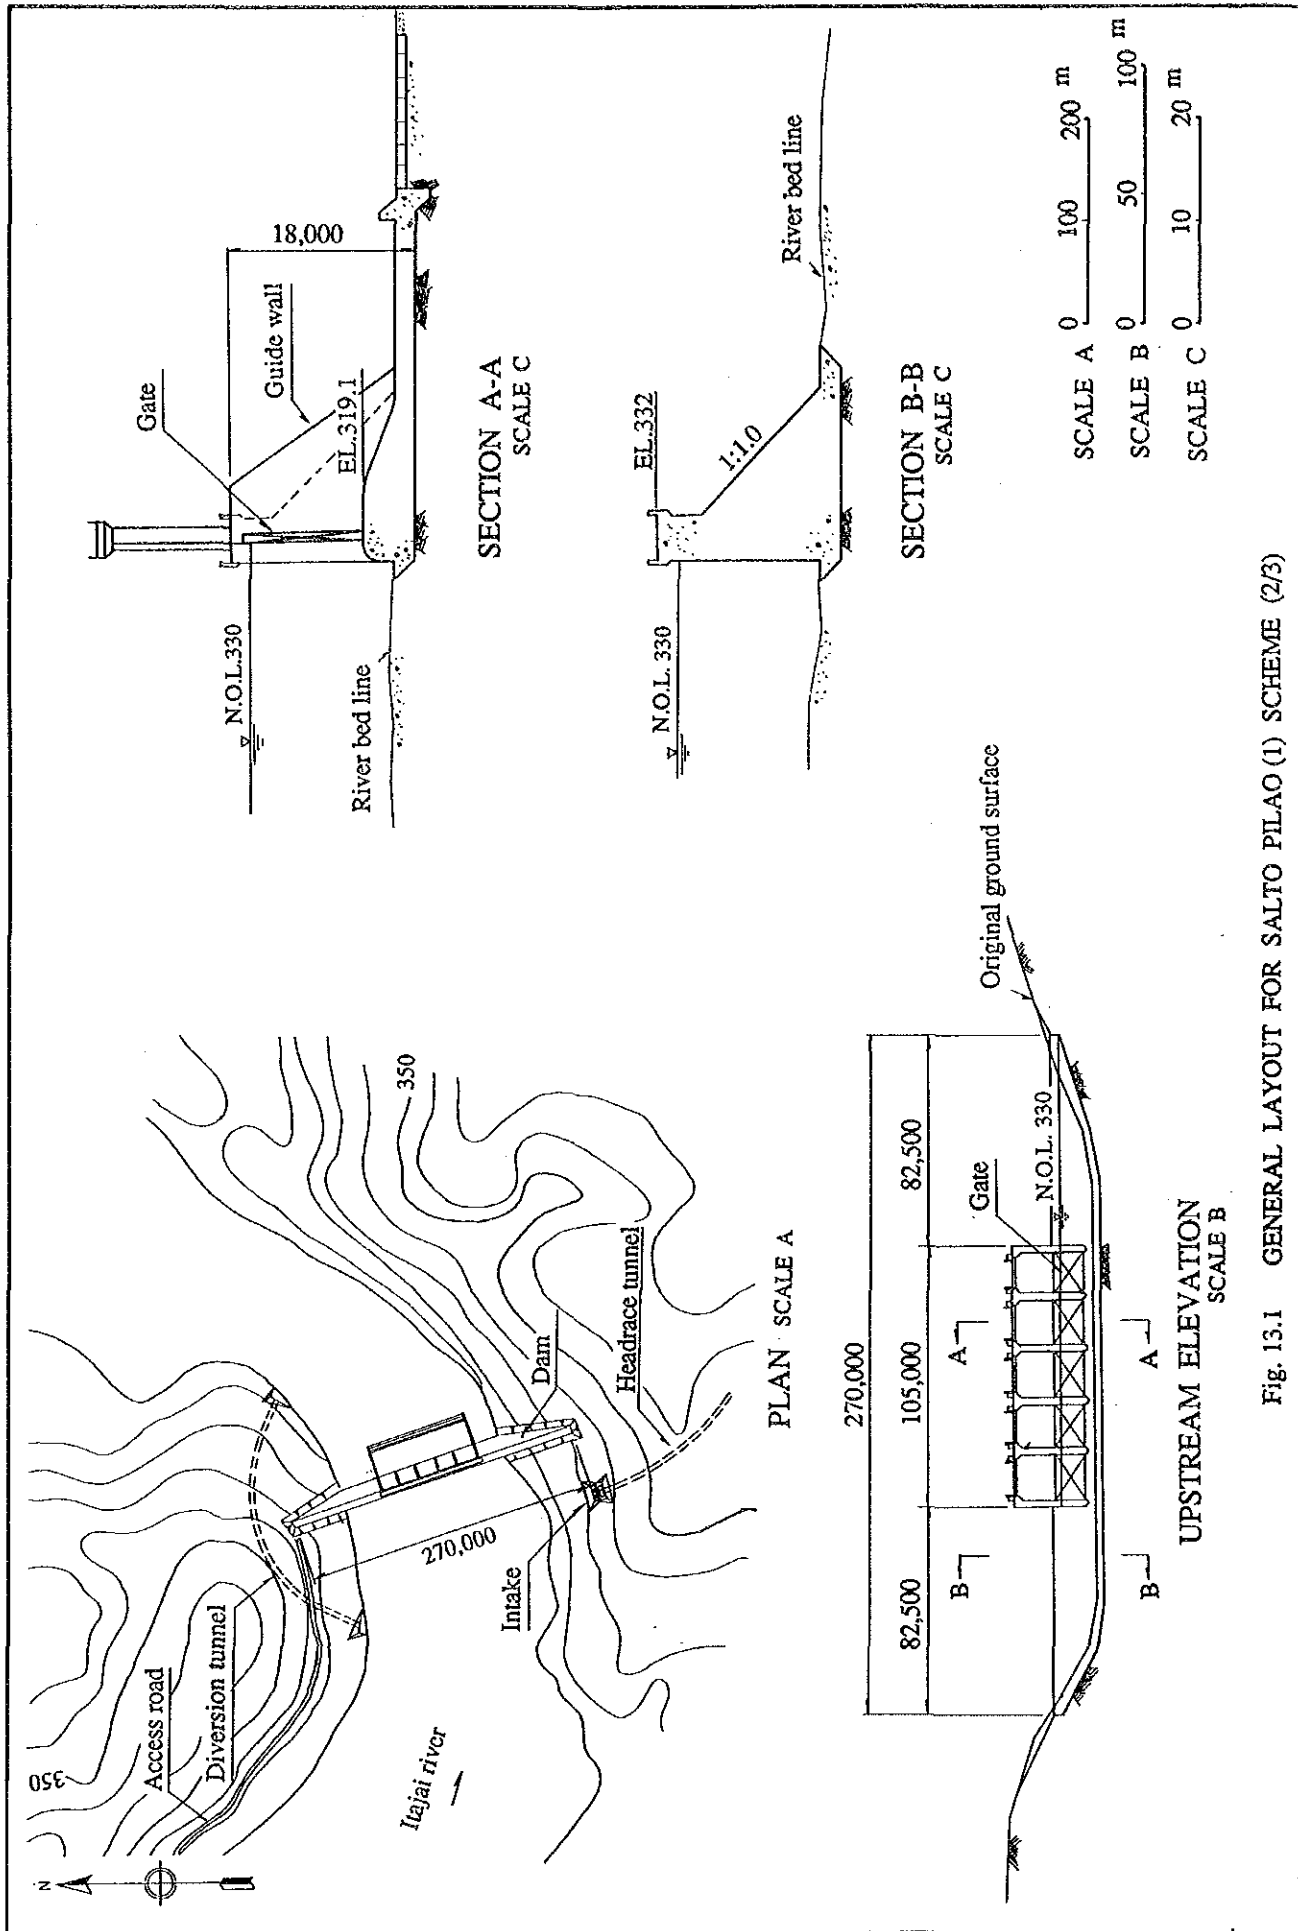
GENERAL LAYOUT FOR SALTO PILAO (1) SCHEME (2/3)
